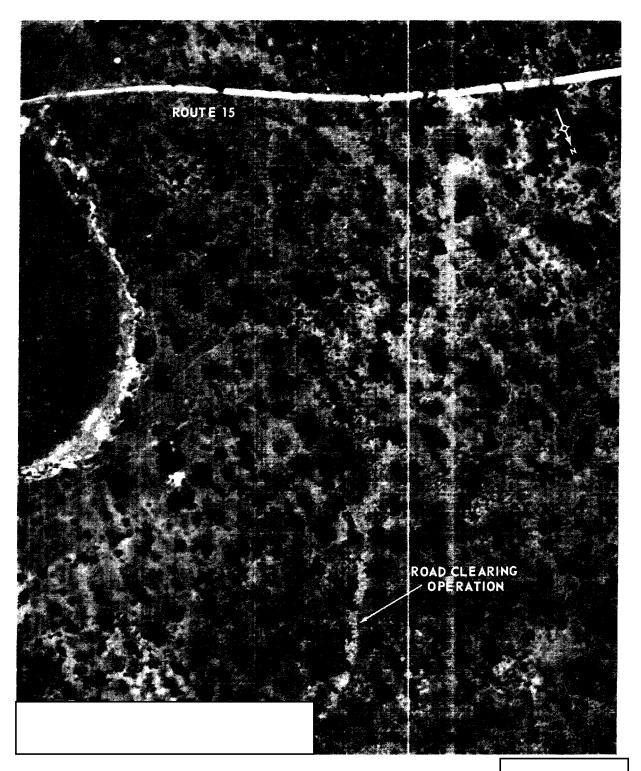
A. AREA OF FUTURE ROAD AND BRIDGE CONSTRUCTION, CAMBUDIA
